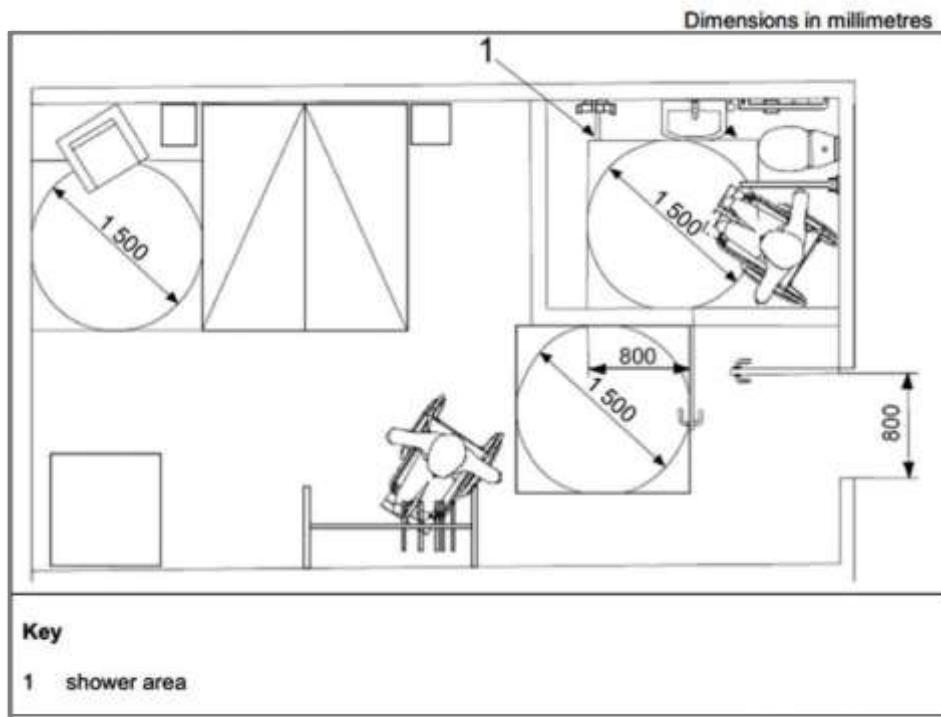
Example of space allowances for accessible bedroom dan bathroom
